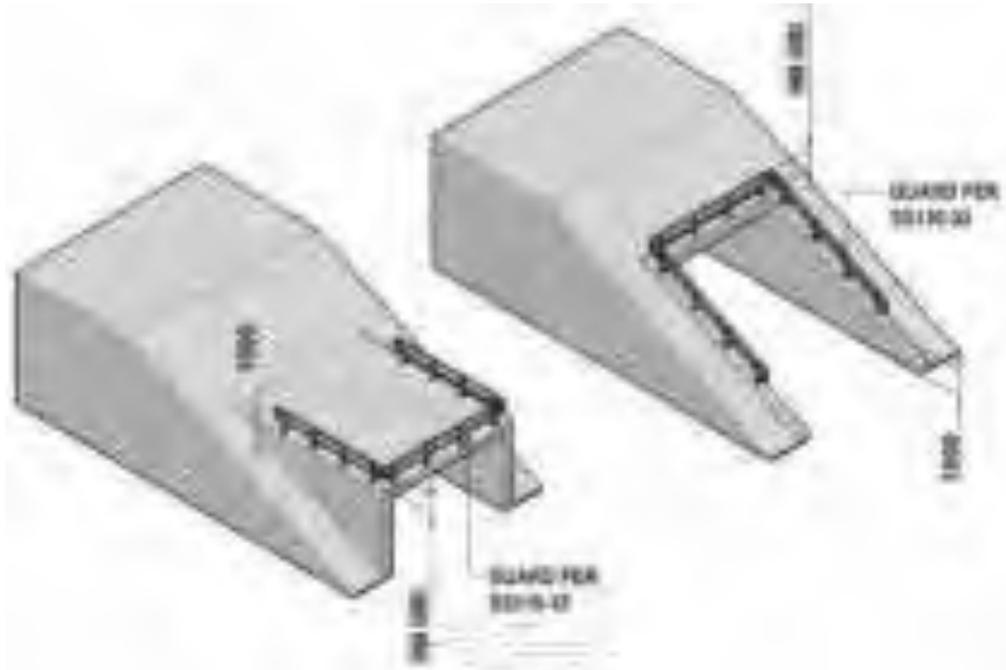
Guard Requirements at Culverts Where Fall Hazard Exceeds 2.4m
